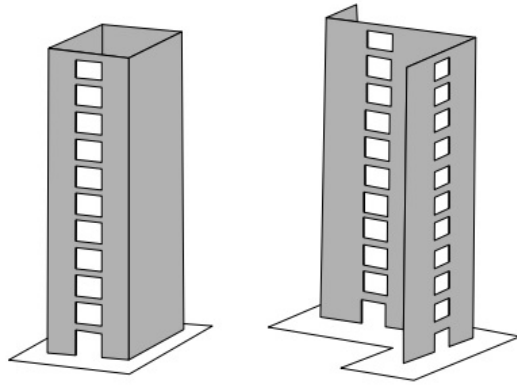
Illustration of coupled shear walls (Rist,V.C.& Swensson S. 2016)
